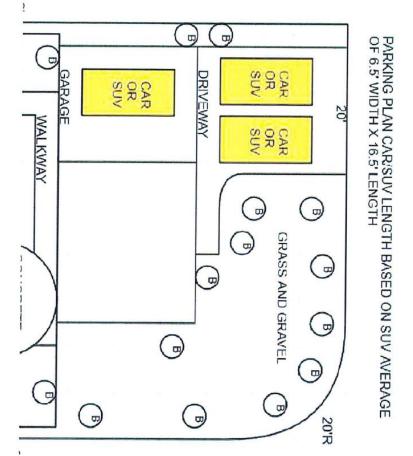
Applicant's parking site plan. Three off-street parking spaces are provided.
